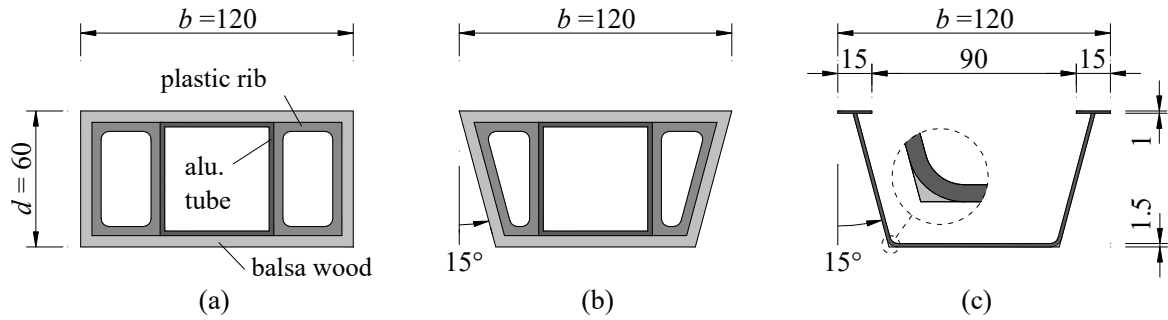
Geometry of the cross sections of the three wind tunnel models: (a) rectangular cross section; (b) trapezoidal cross section; (c) bridge deck with typical open cross section (dimension in mm).
